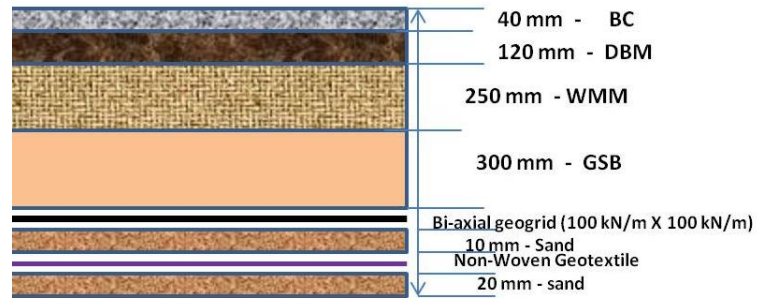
Proposed cross section from Wadala station to Main road(Wadala station and Sion – Koliwada road behind the Wadala Monorail station)
